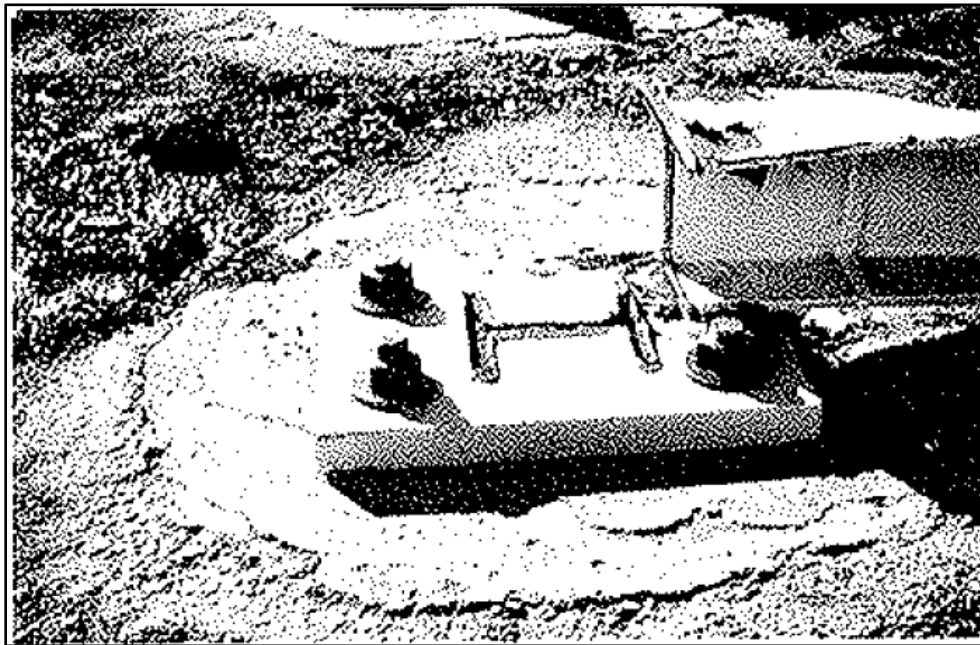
Base Plate Failure Due to Welding (Reprinted from Olson et al., 1967)
